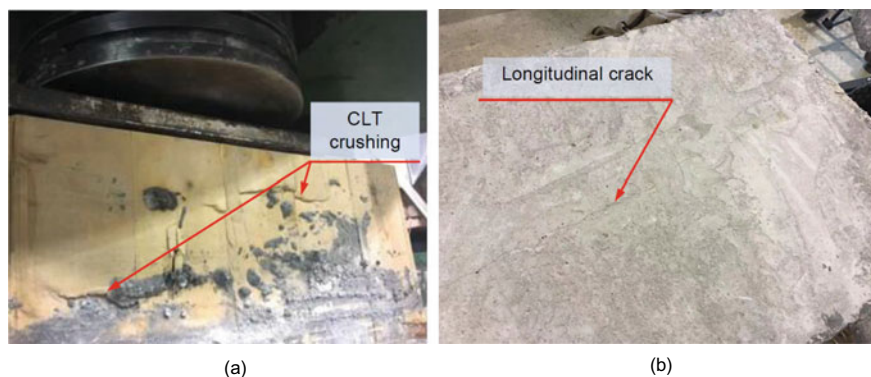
Failures observed in the CLT-concrete composite sections, a CLT top edge crushing; b longitudinal crack observed in the concrete layer
